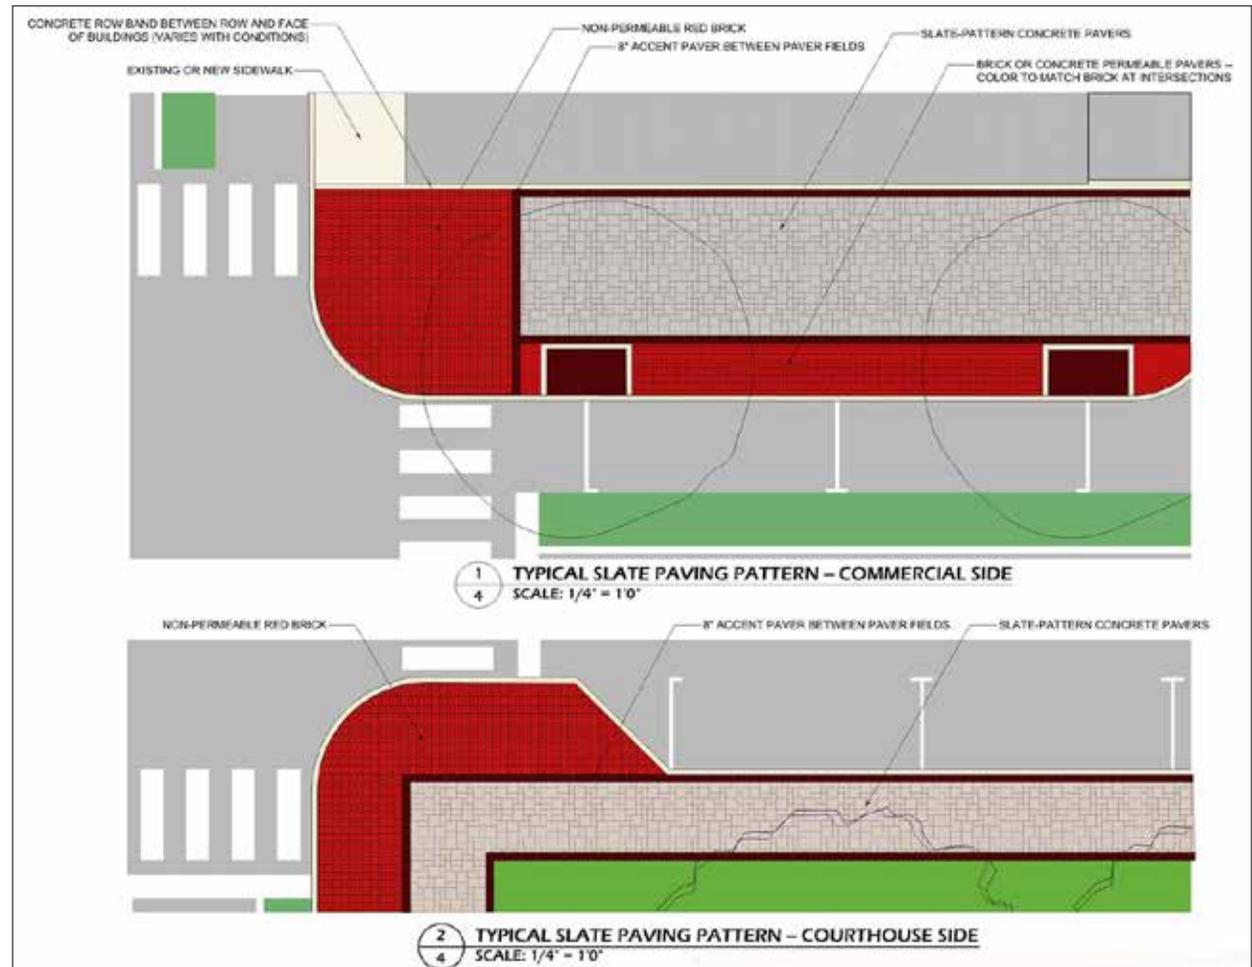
This is the preferred alternative for the sidewalk design, including slate-patterned concrete pavers in the main walkways bordered by concrete or brick pavers, concrete or brick running bond pavers between the tree pits, and basketweave-pattern brick pavers at the corners to transition to nearby existing brick-bordered sidewalks.
